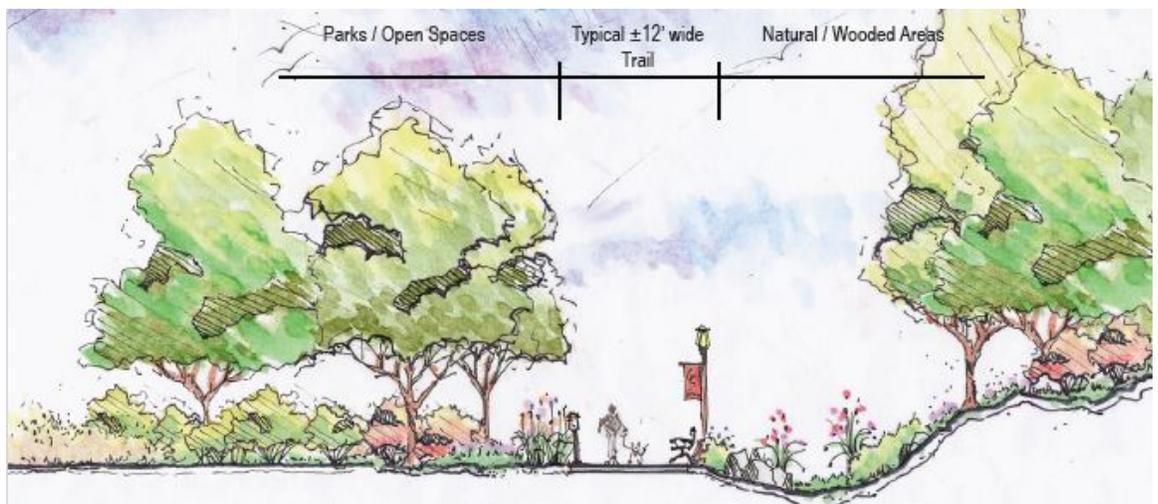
Typical 12 foot Trail Section in Parks or Open Space
